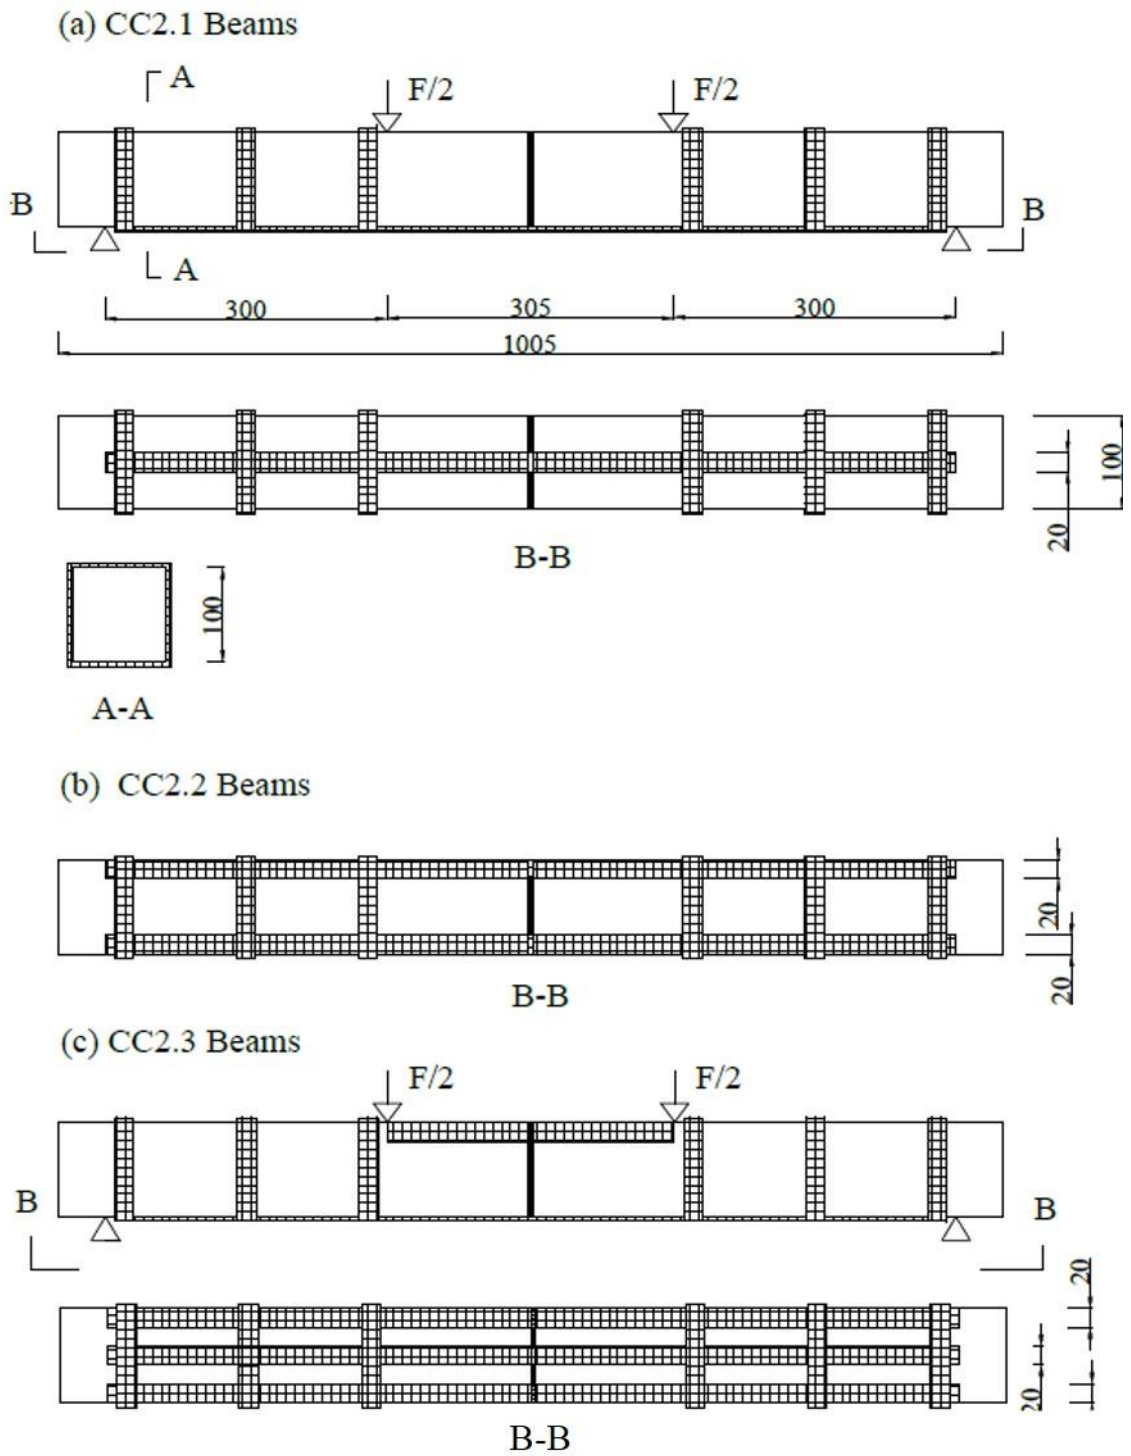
Geometric and strengthening details of the CFRP beams with the joint
